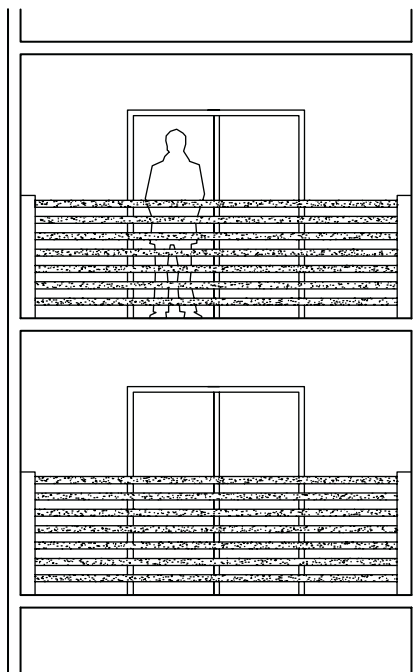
In multistory buildings in northern latitudes, the solar collectors can be mounted vertically on south-facing facades. Here vacuum-tube collectors are used as a balcony railing.
